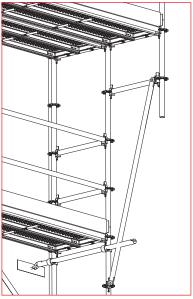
Platform expanded with the 0.73 m console and brace
